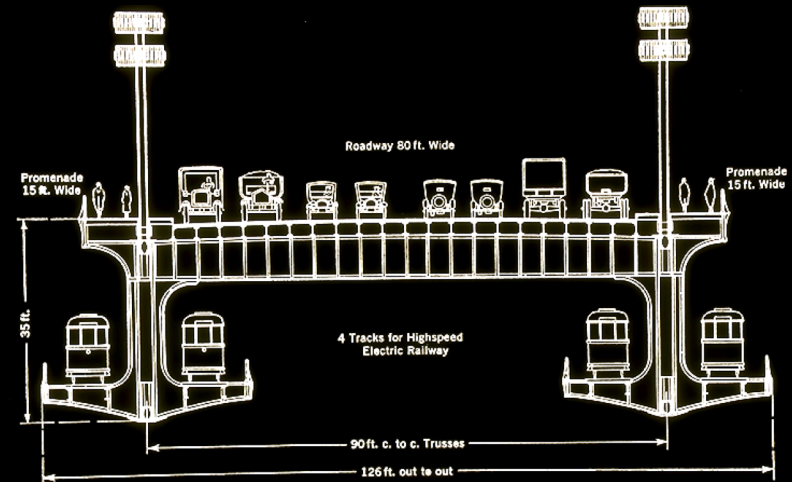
TYPICAL CROSS-SECTION, PROPOSED DESIGN FOR 179TH STREET SUSPENSION BRIDGE
